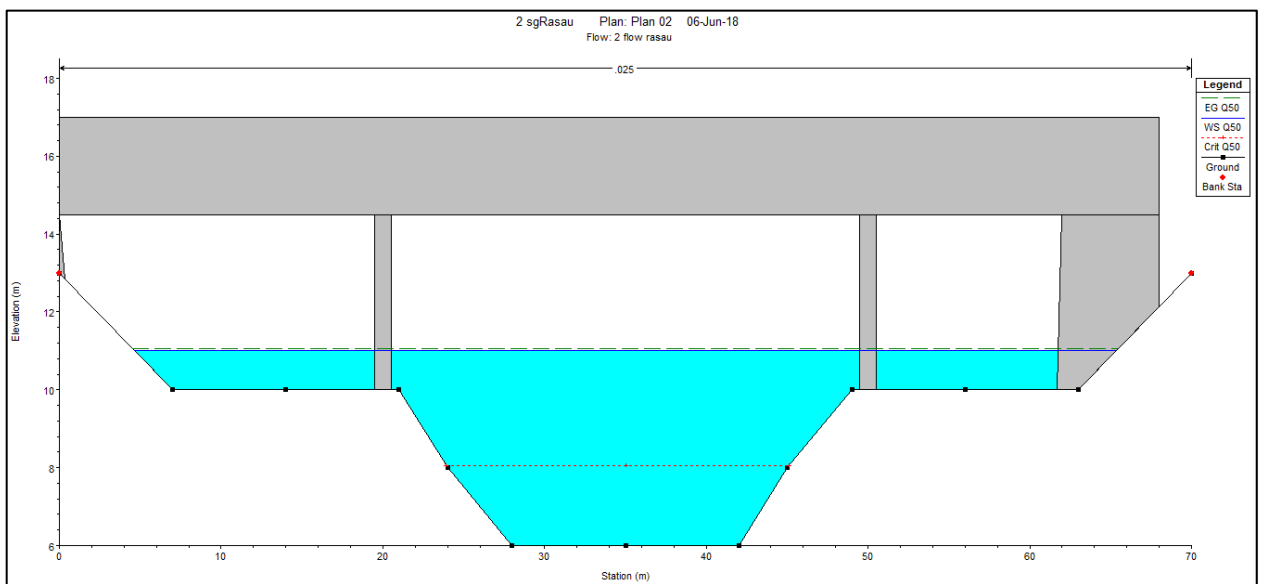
Water level at CH110 upstream of Rasau River (with bridge piers) – Q_{50}
